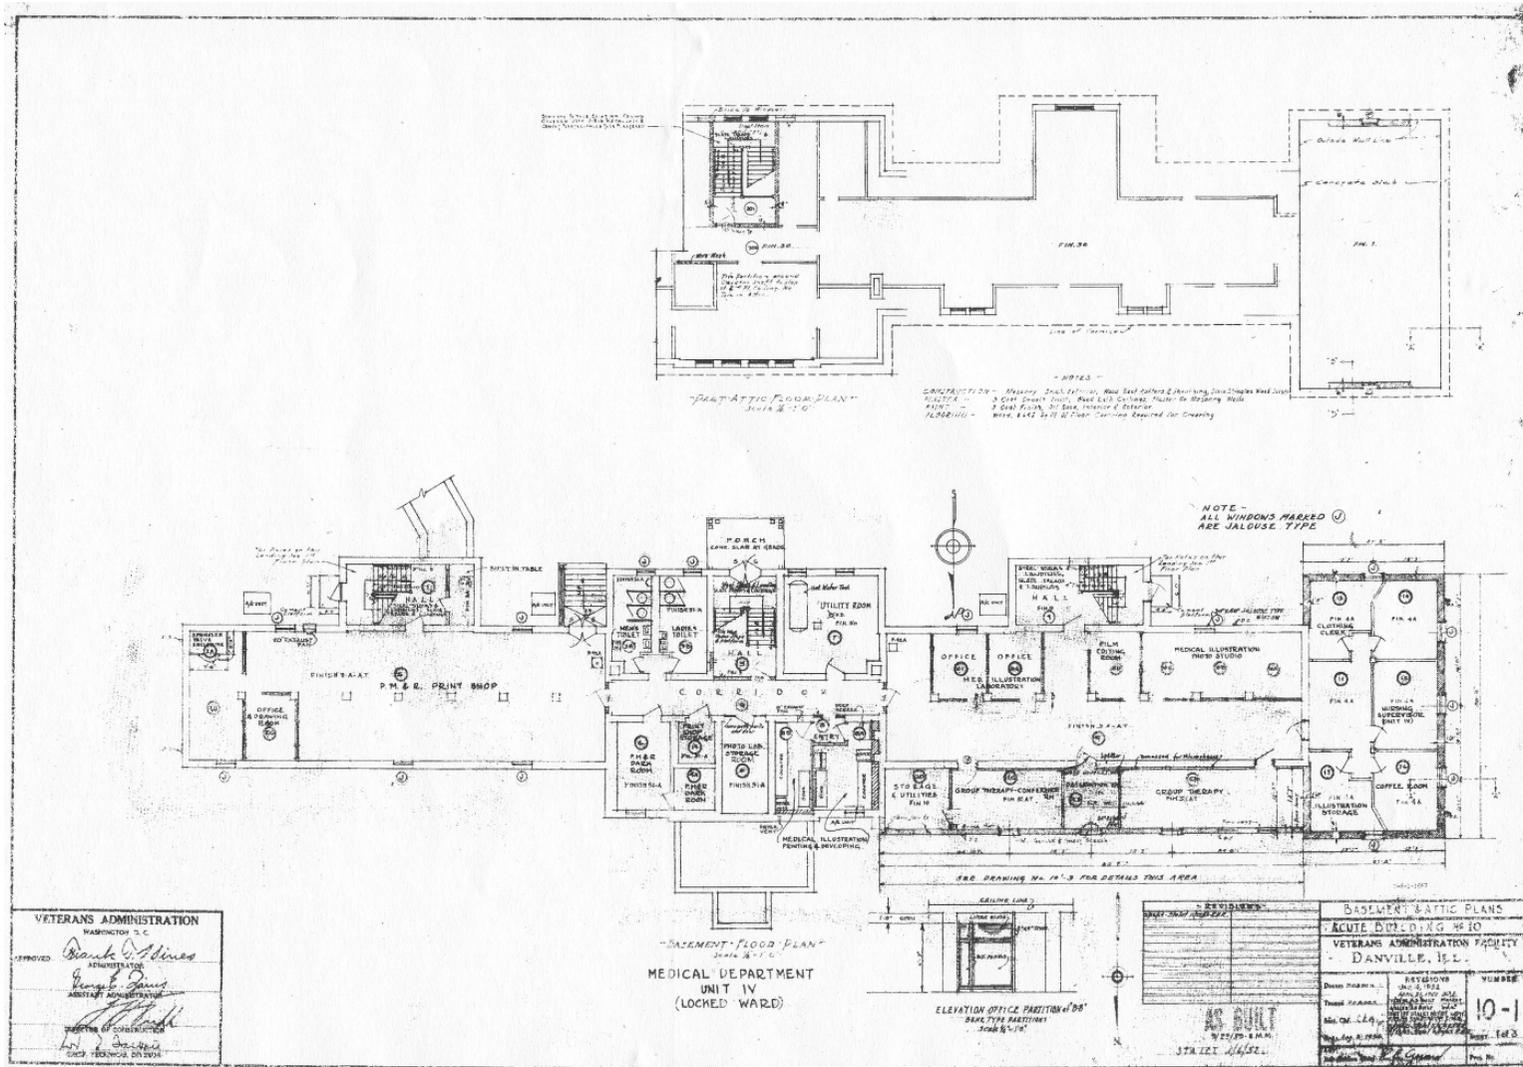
Basement and partial attic plans of Building 10, showing modification undertaken by the VA in 1934 and later.
